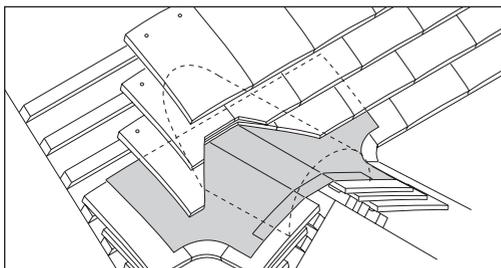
Saddle at ridge/roof/intersection with Plain tiles valley
